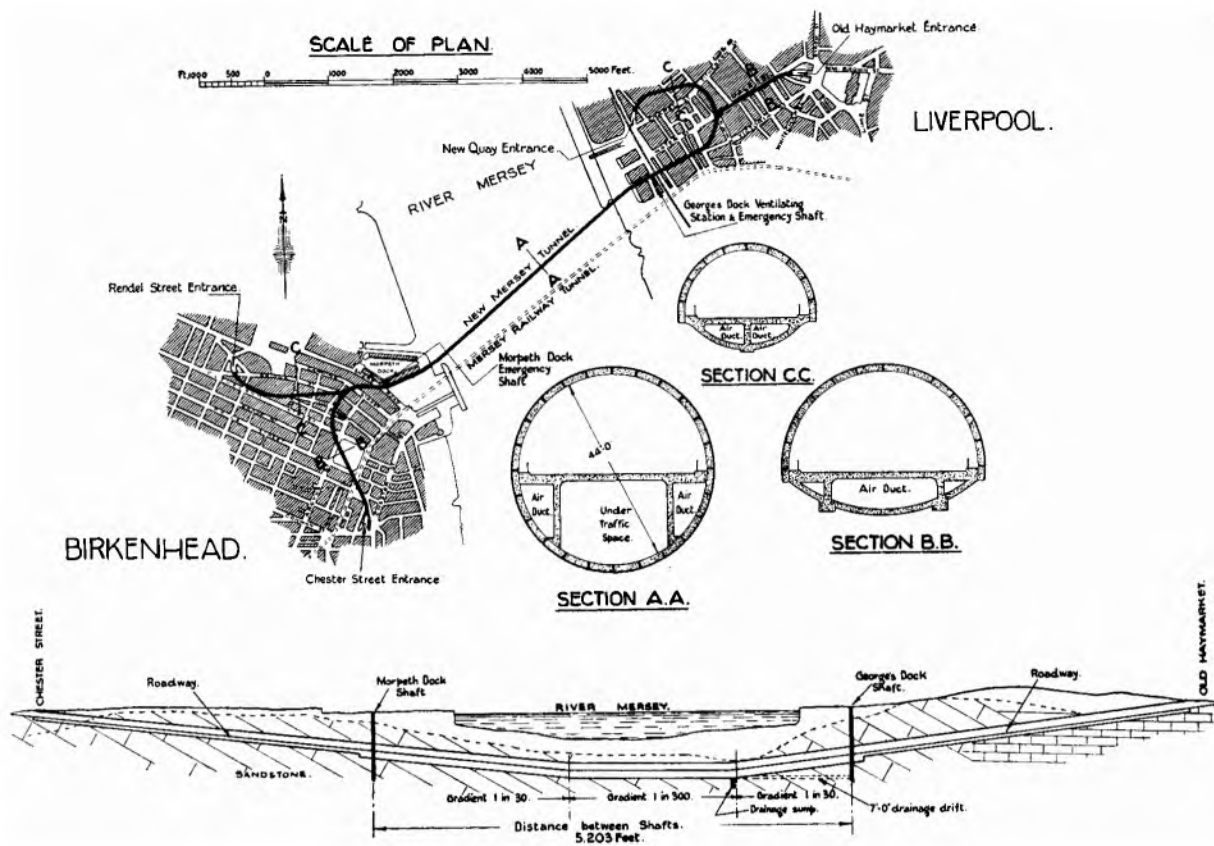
MERSEY TUNNEL, PLAN AND SECTIONS.
